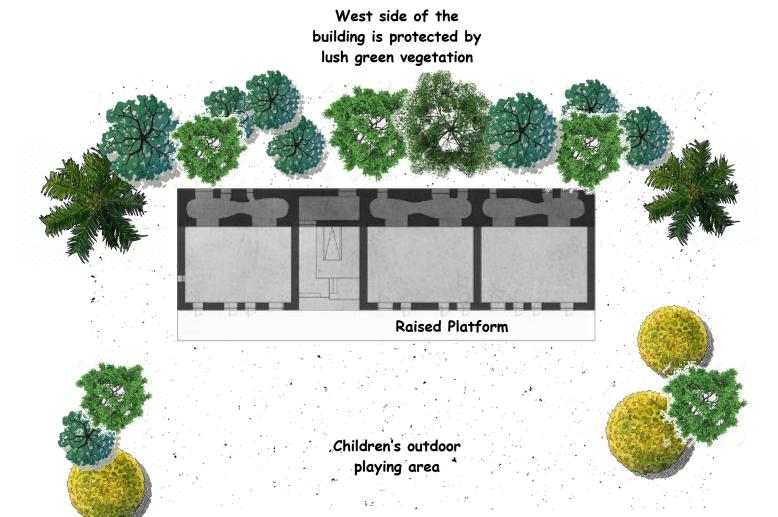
Ground Floor Plan of METI School (Tanvi Naik, 2017)
